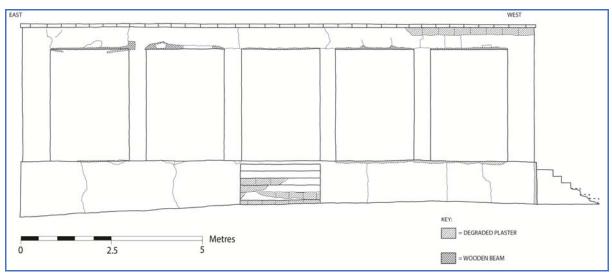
North facing elevation of *Majlis* Structure 2 (External).
